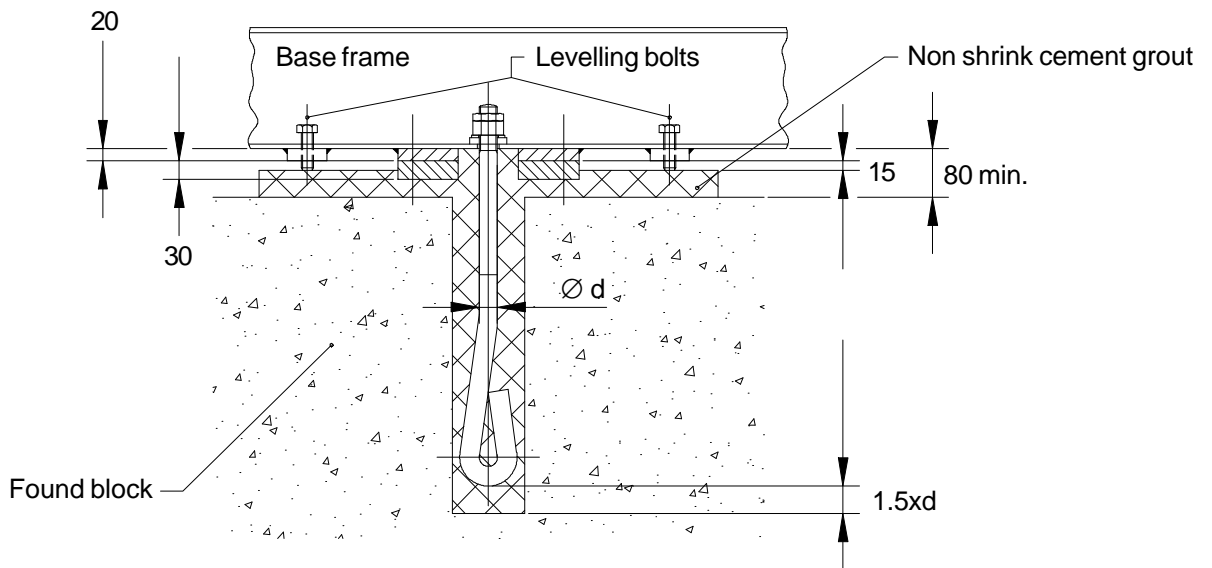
Packer plates in pairs, machined for for base frame with channel
